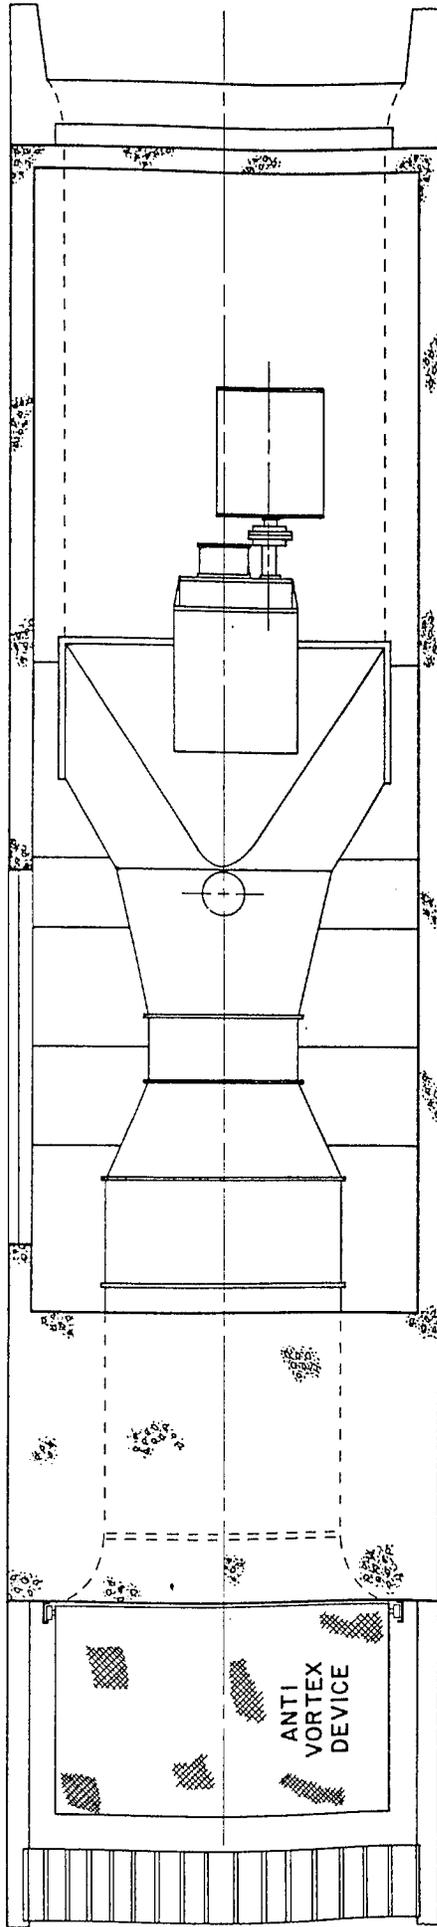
Section view of Alternative C: One 2150 mm horizontal full Kaplan unit.
